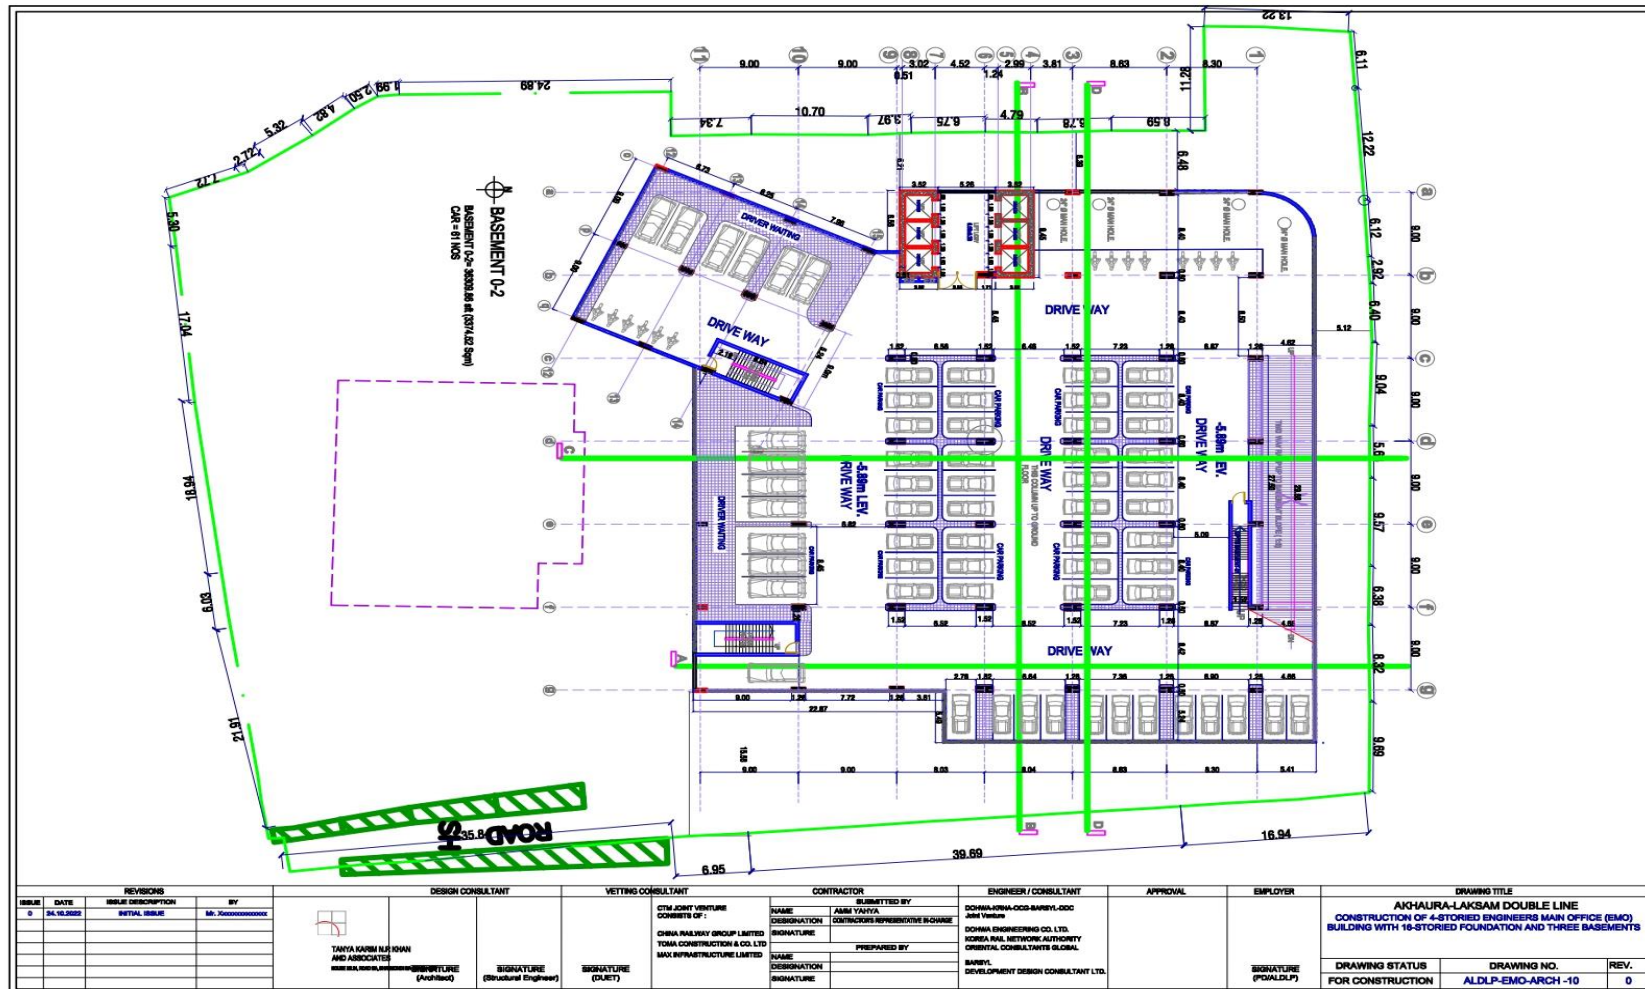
Layout Plan of Proposed EMO Building (Basement-2)
